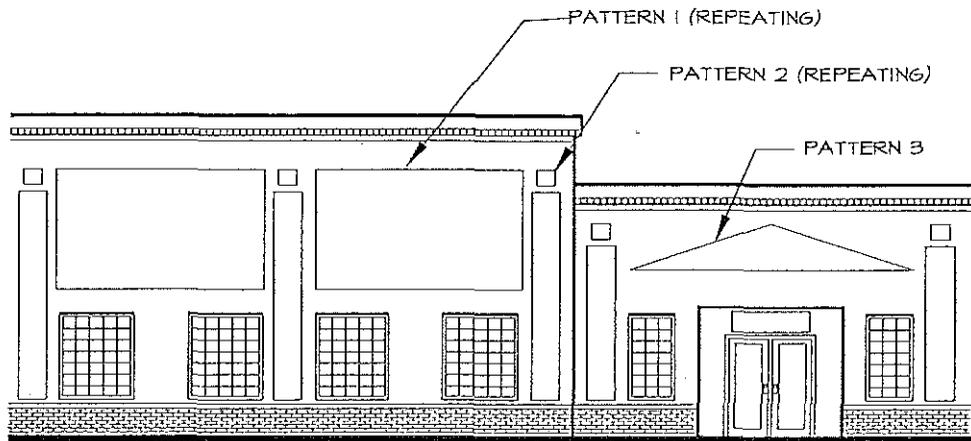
TYPICAL BUILDING FACADE BREAKUP / REPEATING PATTERN
